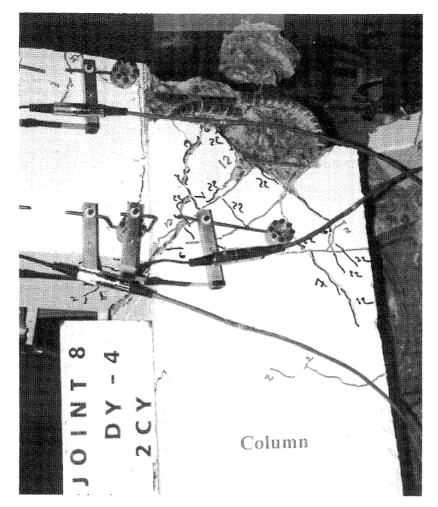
Knee Joint 8 (1960's design) at opening structural ductility factor -4, second cycle.
